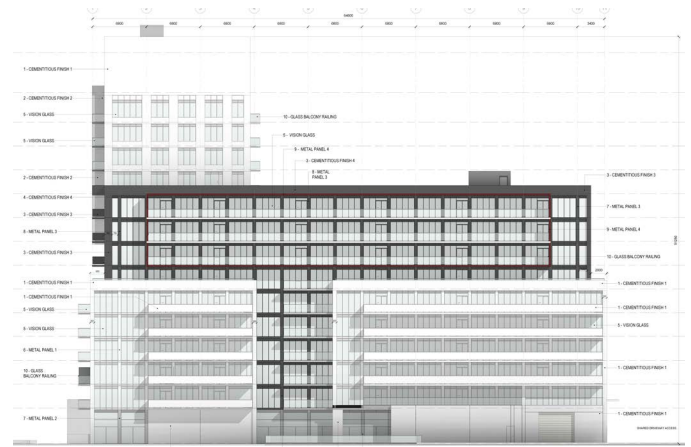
BUILDING ELEVATIONS (ONESPACE UNLIMITED INC., 2022)
